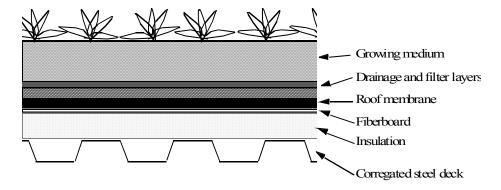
Typical Green Roof Cross-Section (similar to Giant Eagle green roof)
